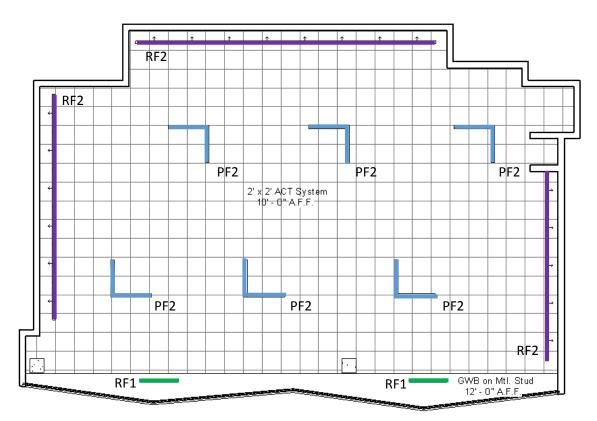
| Reflected Ceiling Plan Main DNA Lab
